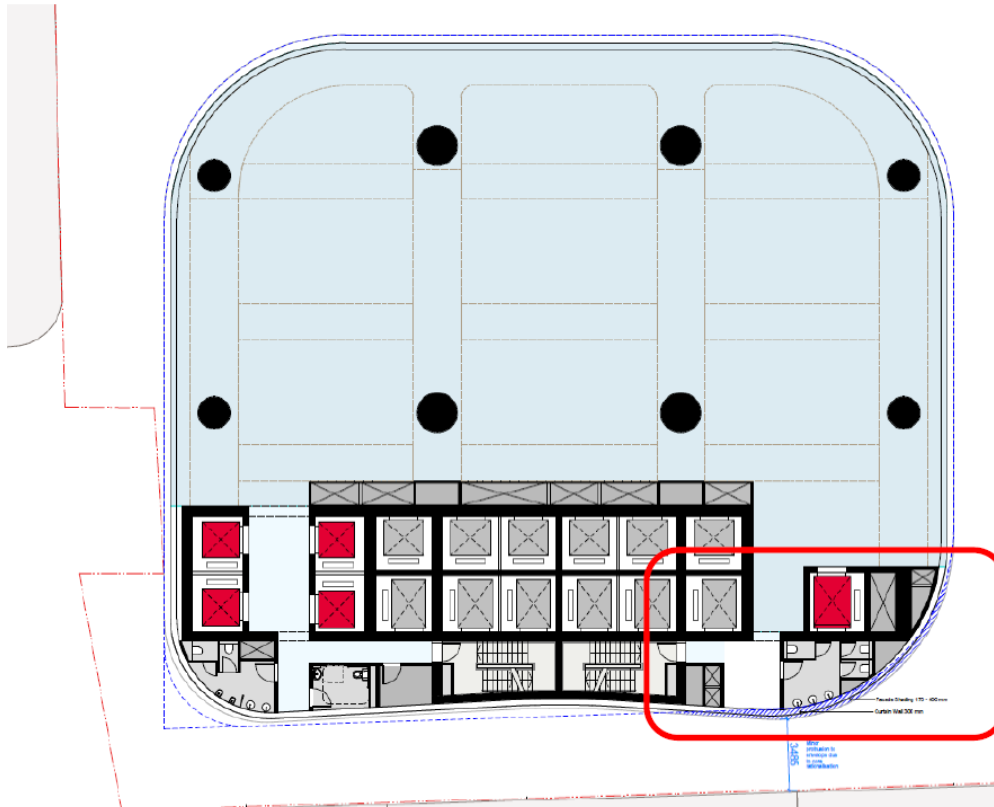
Envelope plan demonstrating sun shading beyond the envelope
